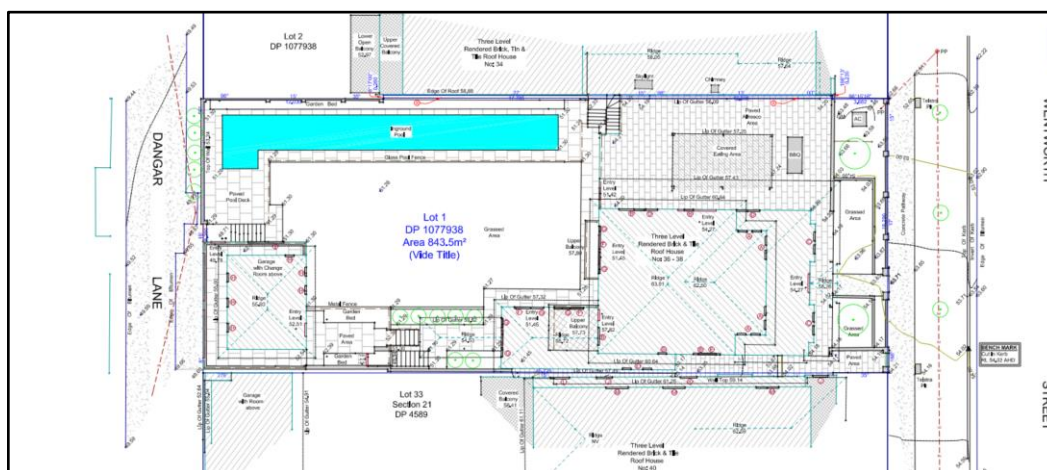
Survey Plan of No. 36-38 Wentworth Street (Source: Hammond Smeallie & Co Pty Ltd)
